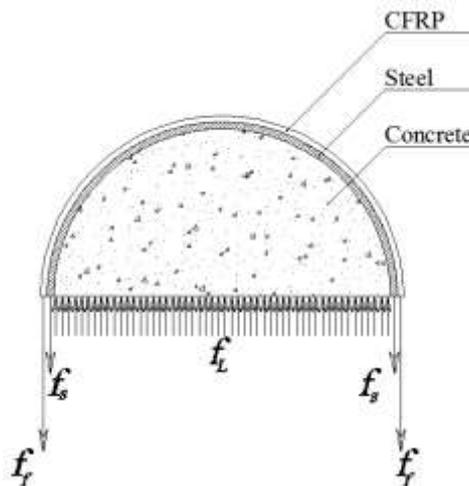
Lateral confining pressure f_l made by steel tube and CFRP layers.
